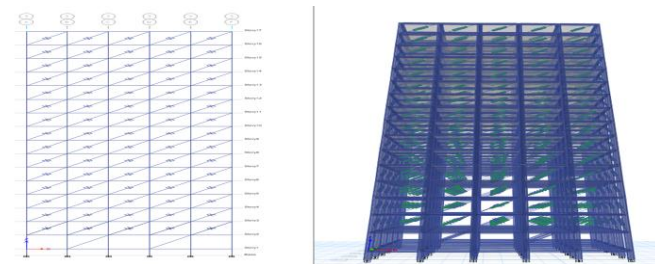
(G+15) storied building with infill wall and diagonal steel bracing in open ground storey
